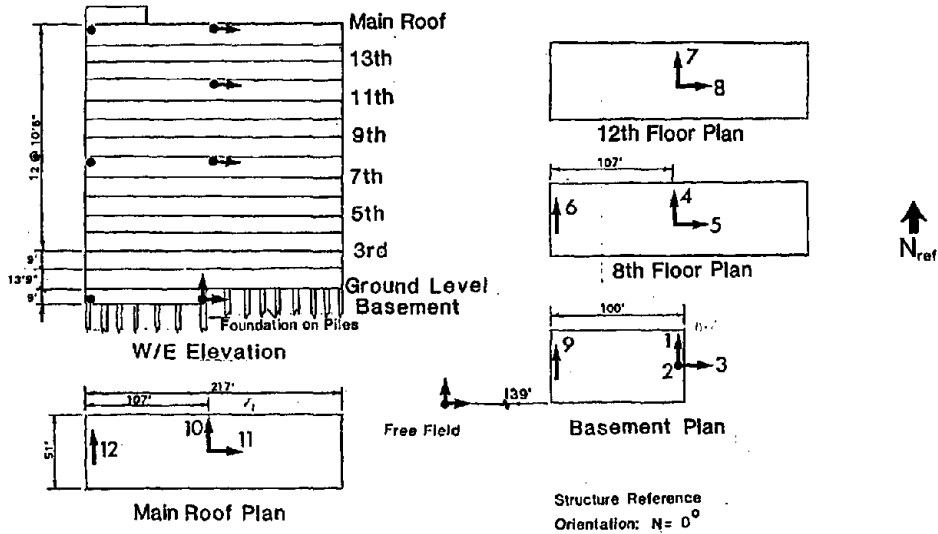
Sensor locations in Hollywood Storage Building, CSMIP Station No. 24236
